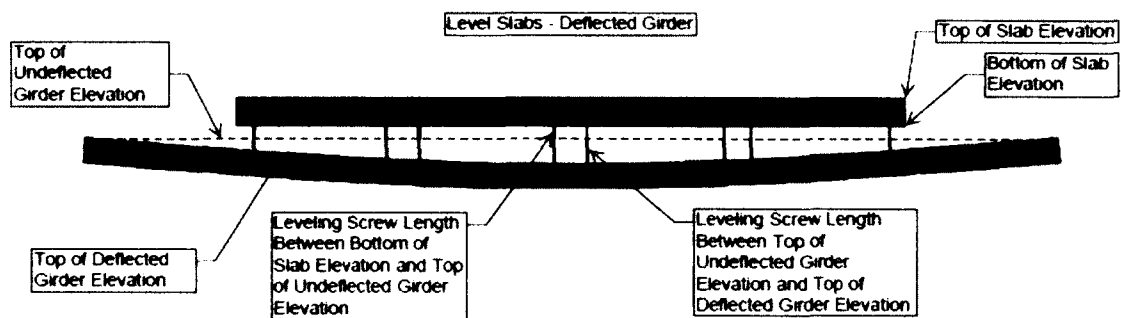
Level Bridge Deck Deflected Girder Leveling Screw Length
